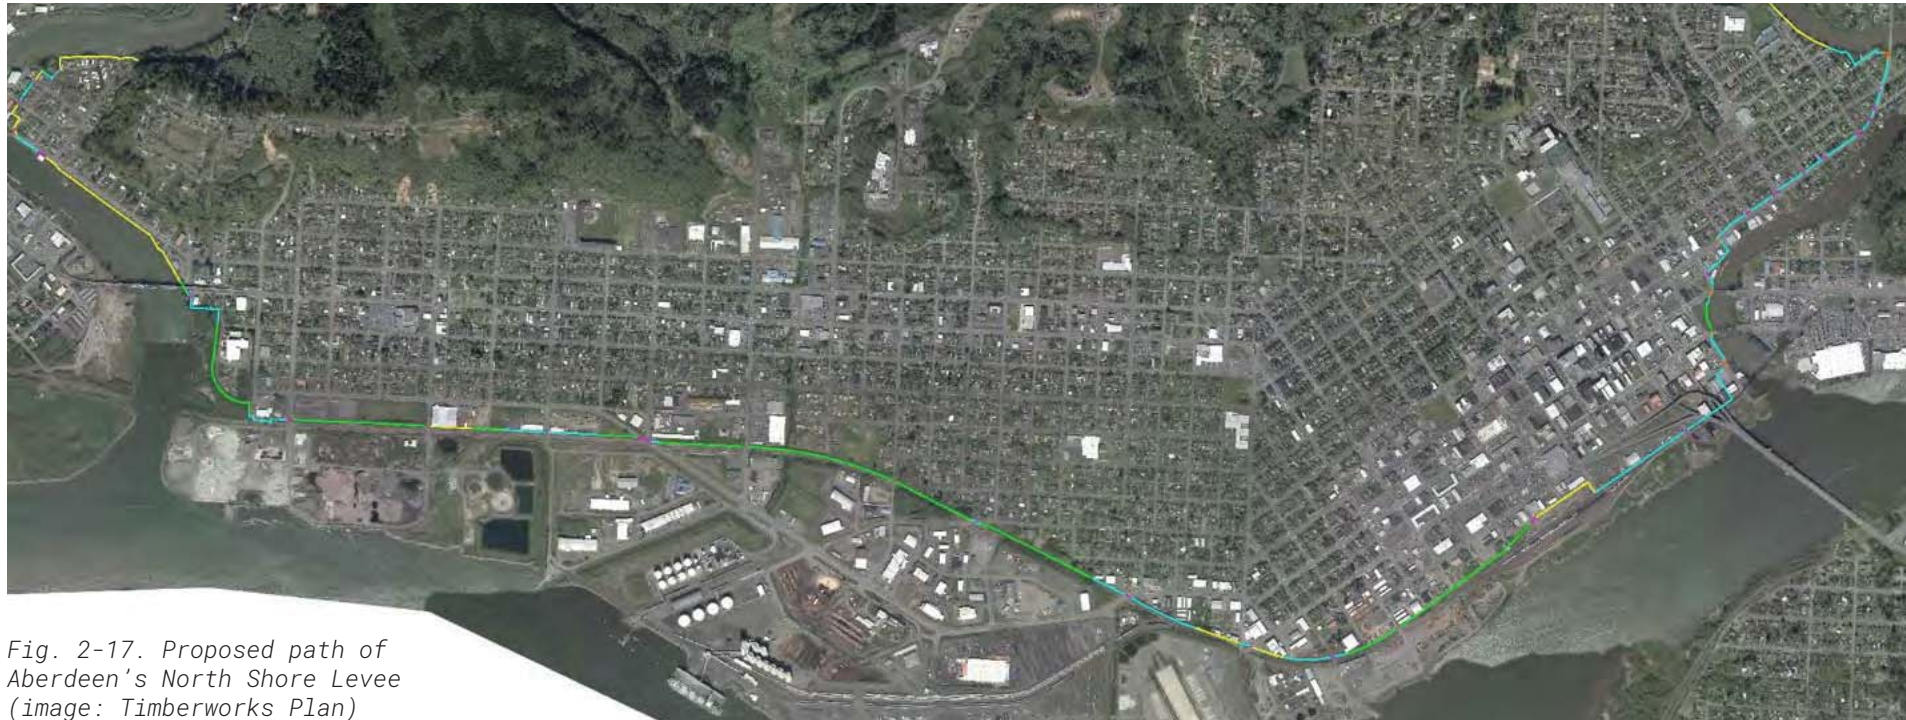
Proposed path of Aberdeen's North Shore Levee (image: Timberworks Plan)
